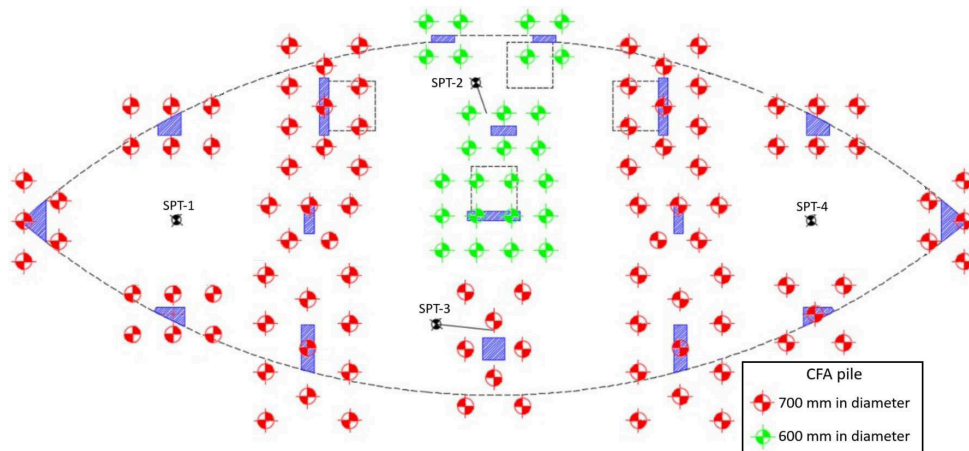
Arrangement of the CFA piles used in the building's foundation.
